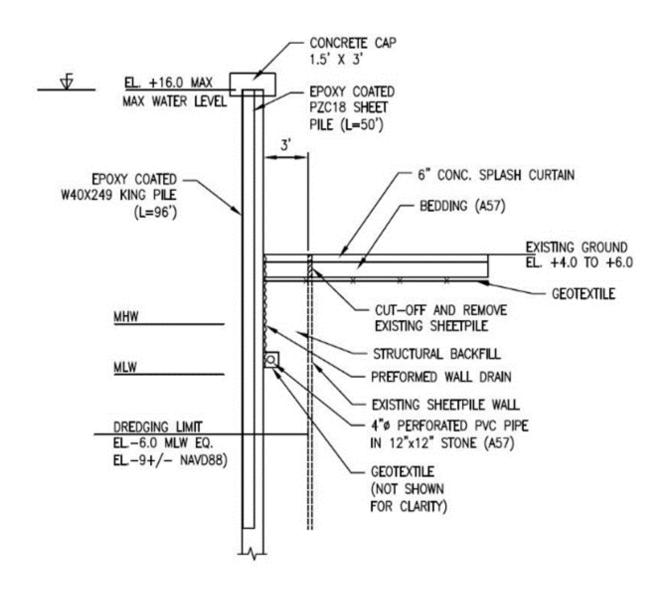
Typical Section Type D King Pile Combined with Sheetpile Floodwall (Perimeter Plans)
